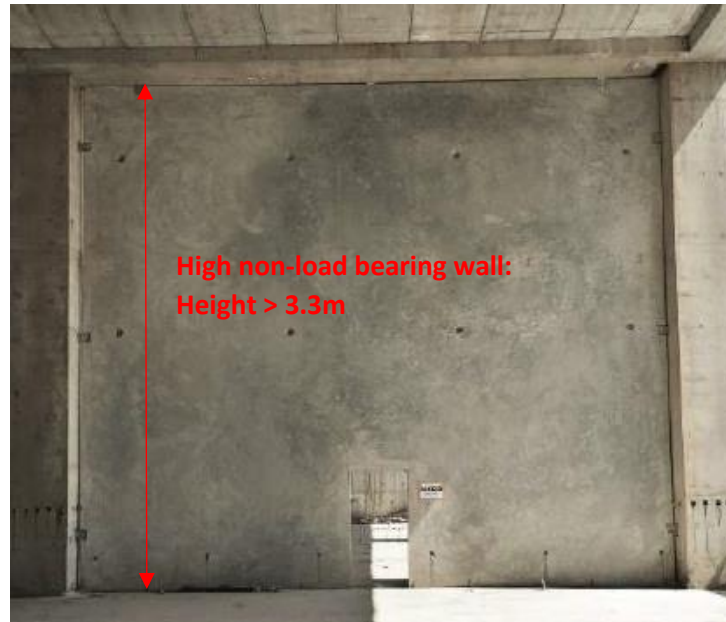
Non-load bearing wall exceeding 3.3 metres is considered as high non-load bearing wall
